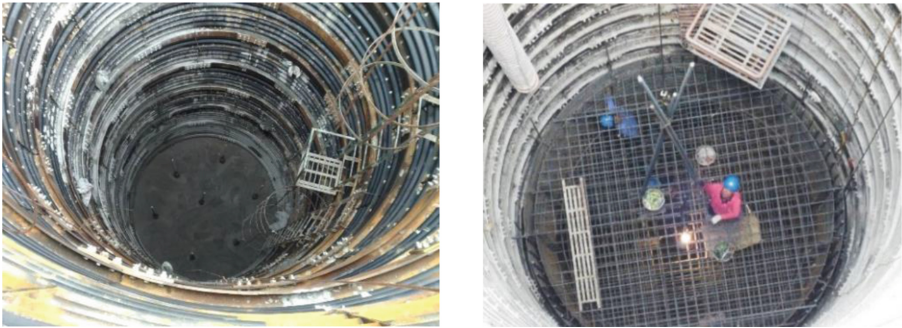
Pile manual excavation and rebar cage of pile assembling
